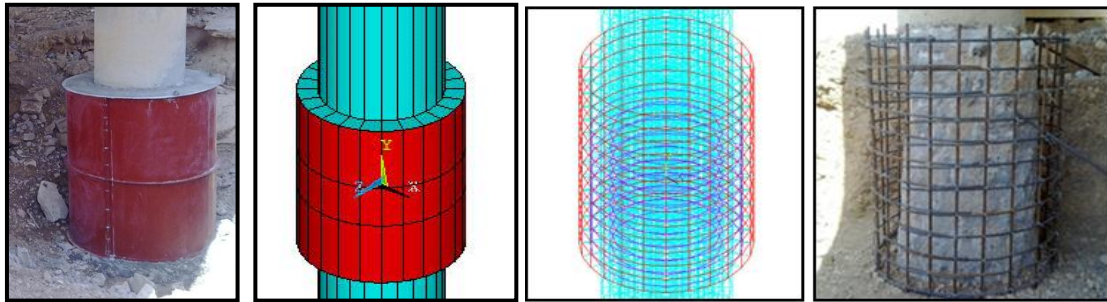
Actual and Modeling of Steel Reinforcement and Casing in Damaged Joints
